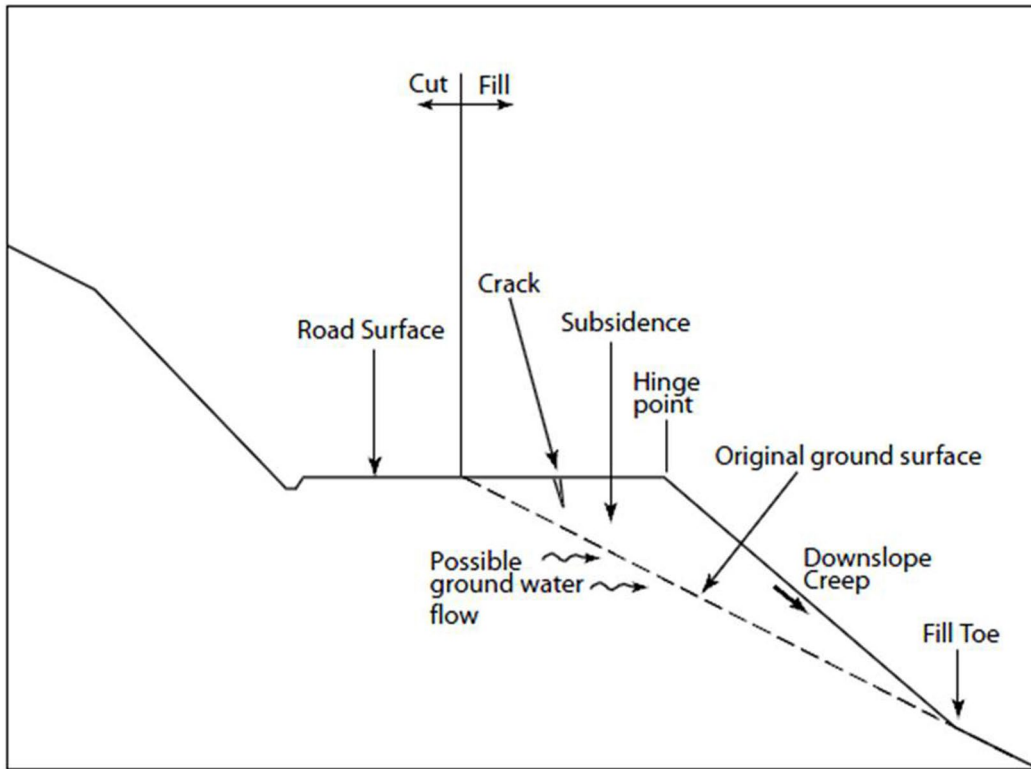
Cross section of typical sidecast road embankment fill (Musser and Denning, 2005).
